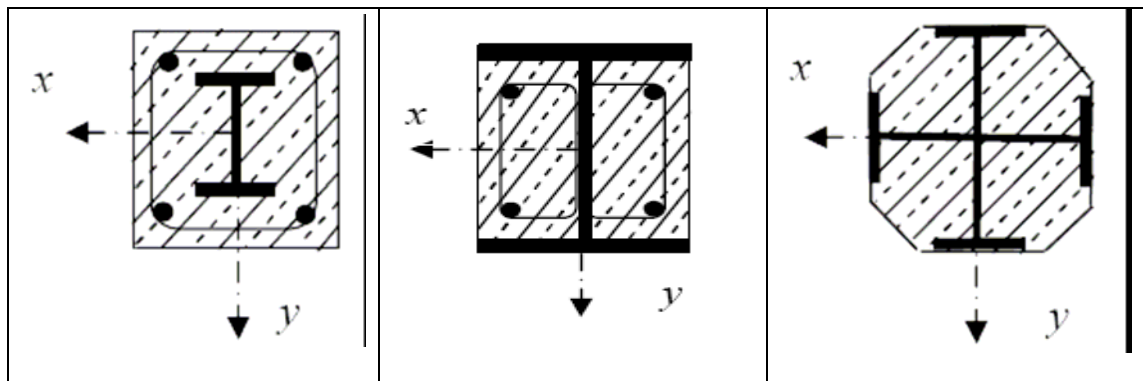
Typical cross - sections of fully and partially concrete encased columns.
